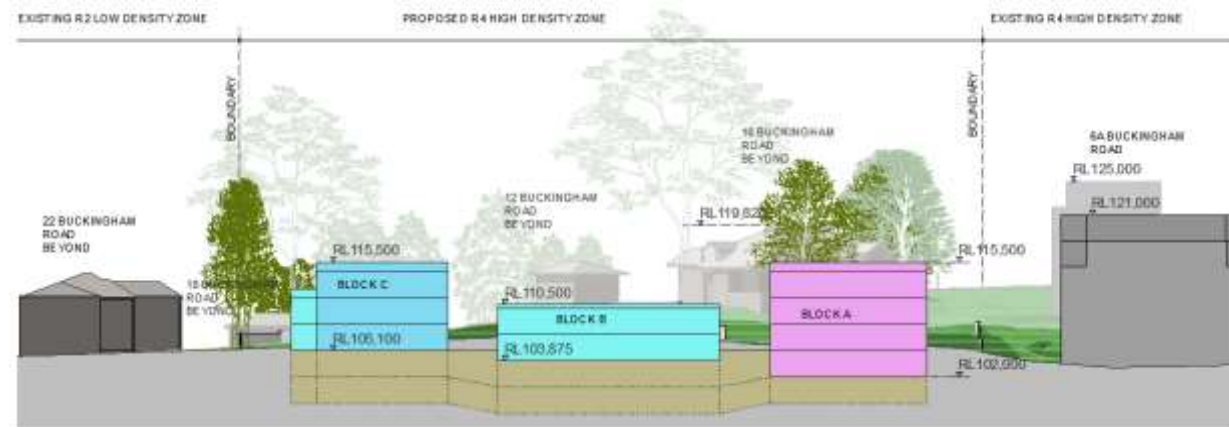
Proposed indicative section with maximum RL's proposed.
